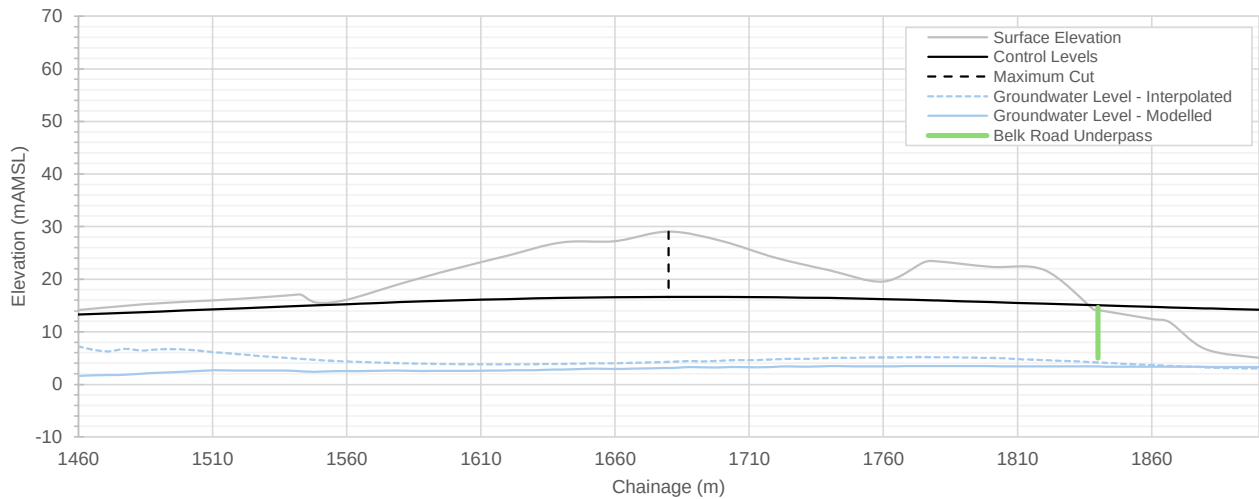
Long section along 1460 to 1860 m (SH29_Cut 1 and Belk Road Underpass).
